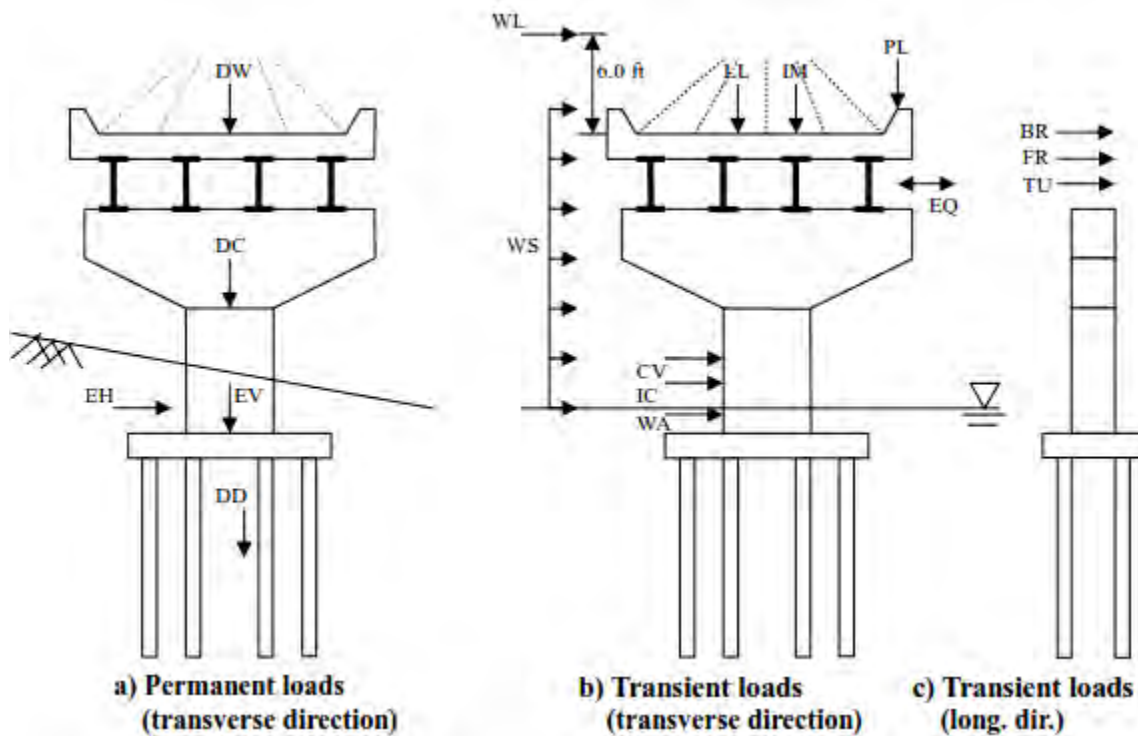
Typical loads in bridge piers supported on deep foundations.
